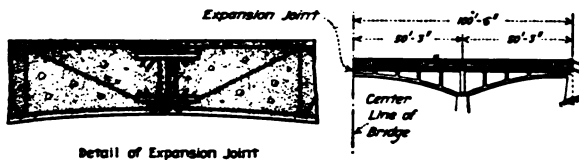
Half-elevation and detail of expansion joint of arch-shaped cantilever bridge over Rouge River, Wayne County, Mich.
